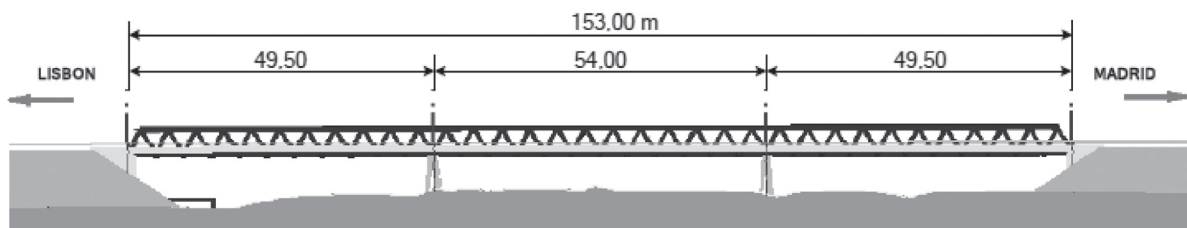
Semi-through truss bridge for the railroad line between Lisbon and Madrid (drawing courtesy of Professor António Reis).
